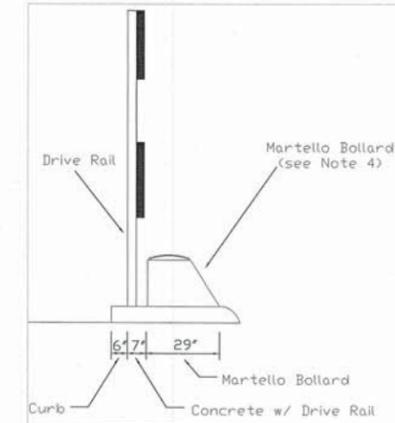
7' to <10' Island Front w/ Single Bollard (Plan)
